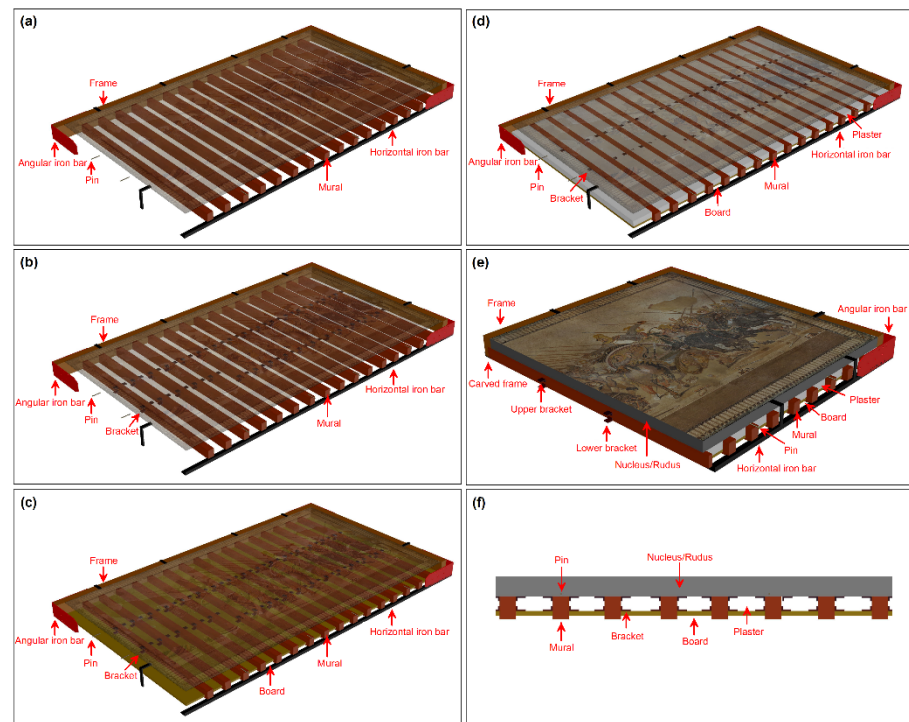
Hypothesis 3 digital model: positions of vertical beams (a), locations of anchoring brackets (b), arrangement of closing tables (c), complete support system (d), cross-section (e) and longitudinal section (f).
